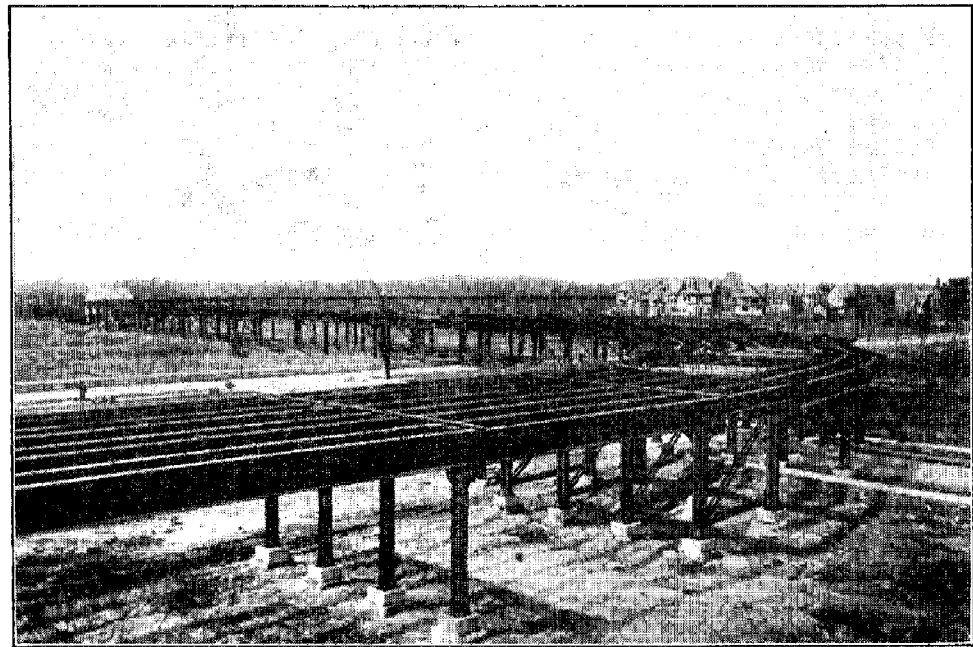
Vicinity of Sheridan Road and Irving Park Boulevard, Chicago, during elevated railroad construction.
